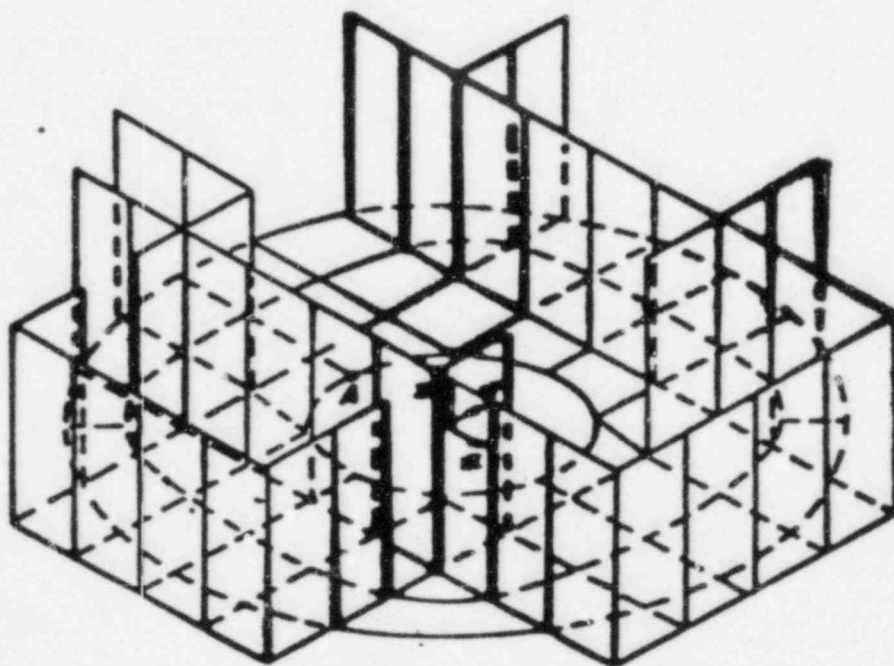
Finite Element Mesh of Drywell Roof Slab
